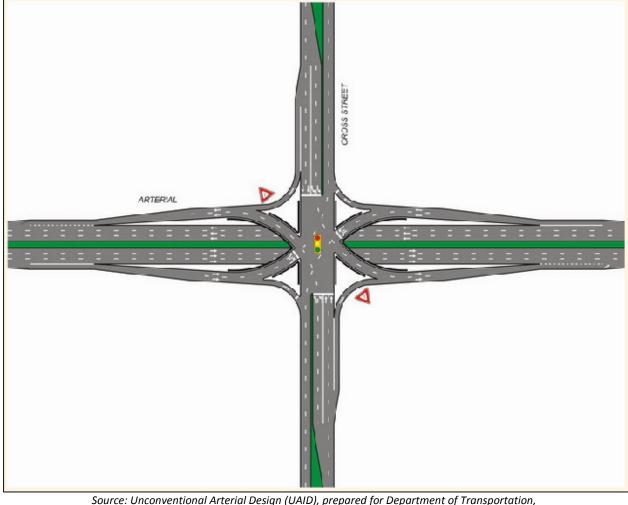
Concept Design of SPUI Intersection Geometric Improvement
